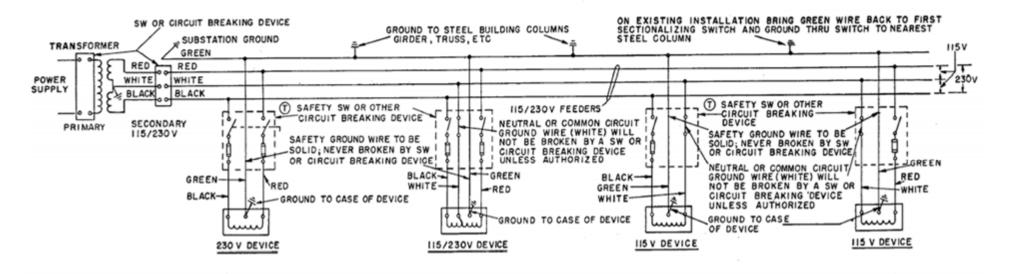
Typical grounding system for a building and heavy electrical apparatus in the building
